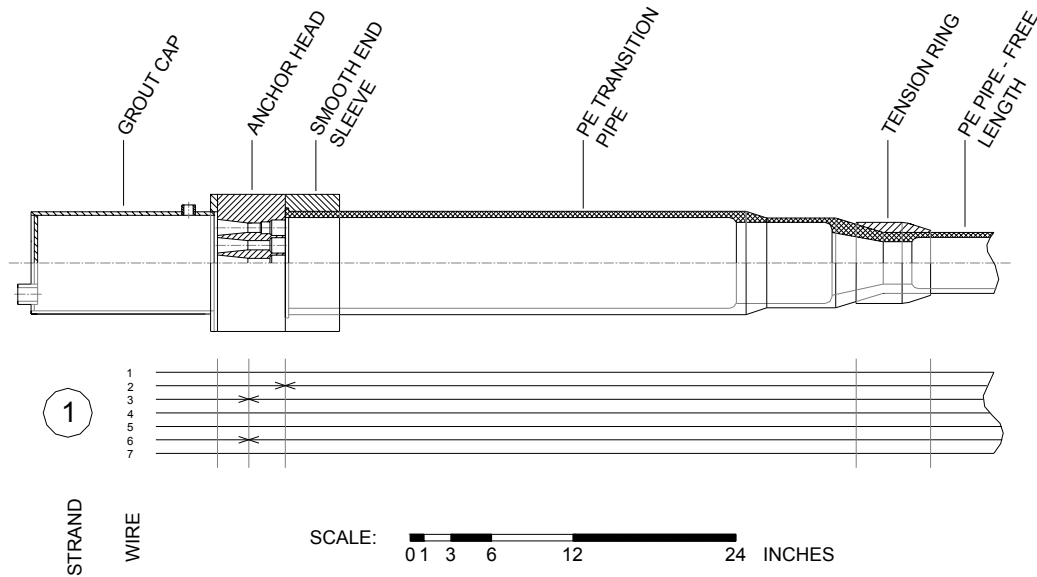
Location of wire breaks near the deck anchorage - Specimen 9
